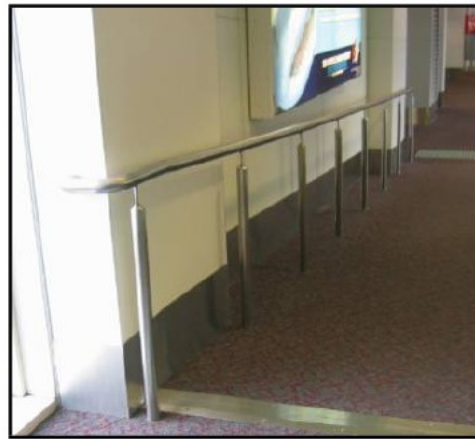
(Top left) Correct application of returning the handrail down and back onto itself to form 180° return onto a post. The handrails also provide clearances on the top 270° arc of the handrail and the 15mm directly under the handrail to allow for uninterrupted transition along the full length of the handrail for fingers and thumbs.
